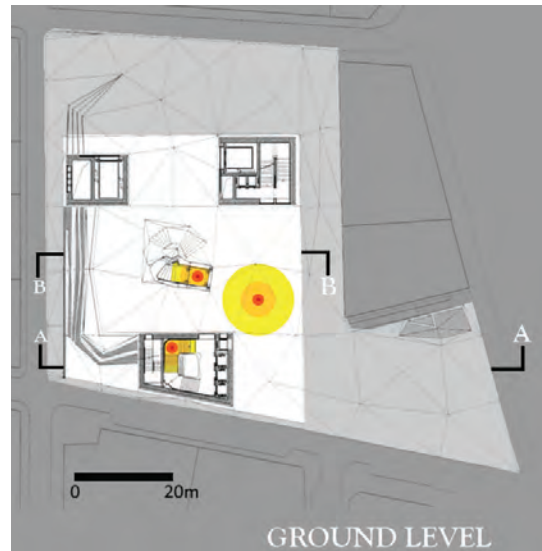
Site plan and ground floor access to the CaixaForum Madrid.
